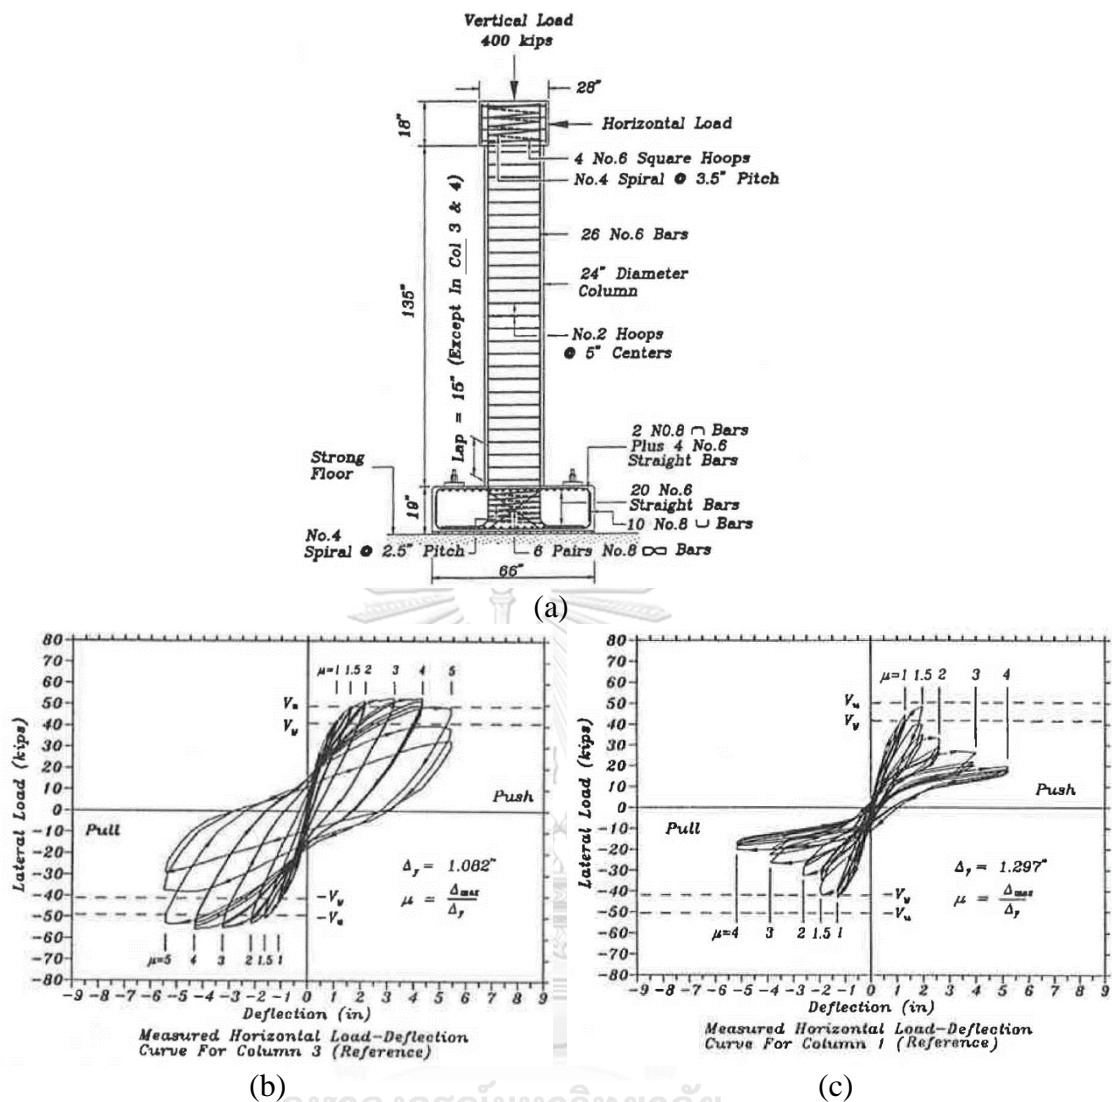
RC columns tested by Chai et al. [19] (a) details, (b) with continuous reinforcement into the footing, and (c) with a substandard lap splice.
